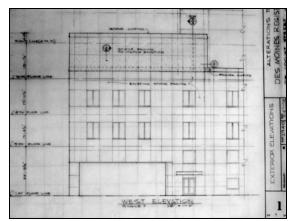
West elevation, 1978 single-story rooftop addition to 1967 rear north addition (first proposed in 1966 plans). (Brooks Borg Skiles AE in Jacobsen: 17)
